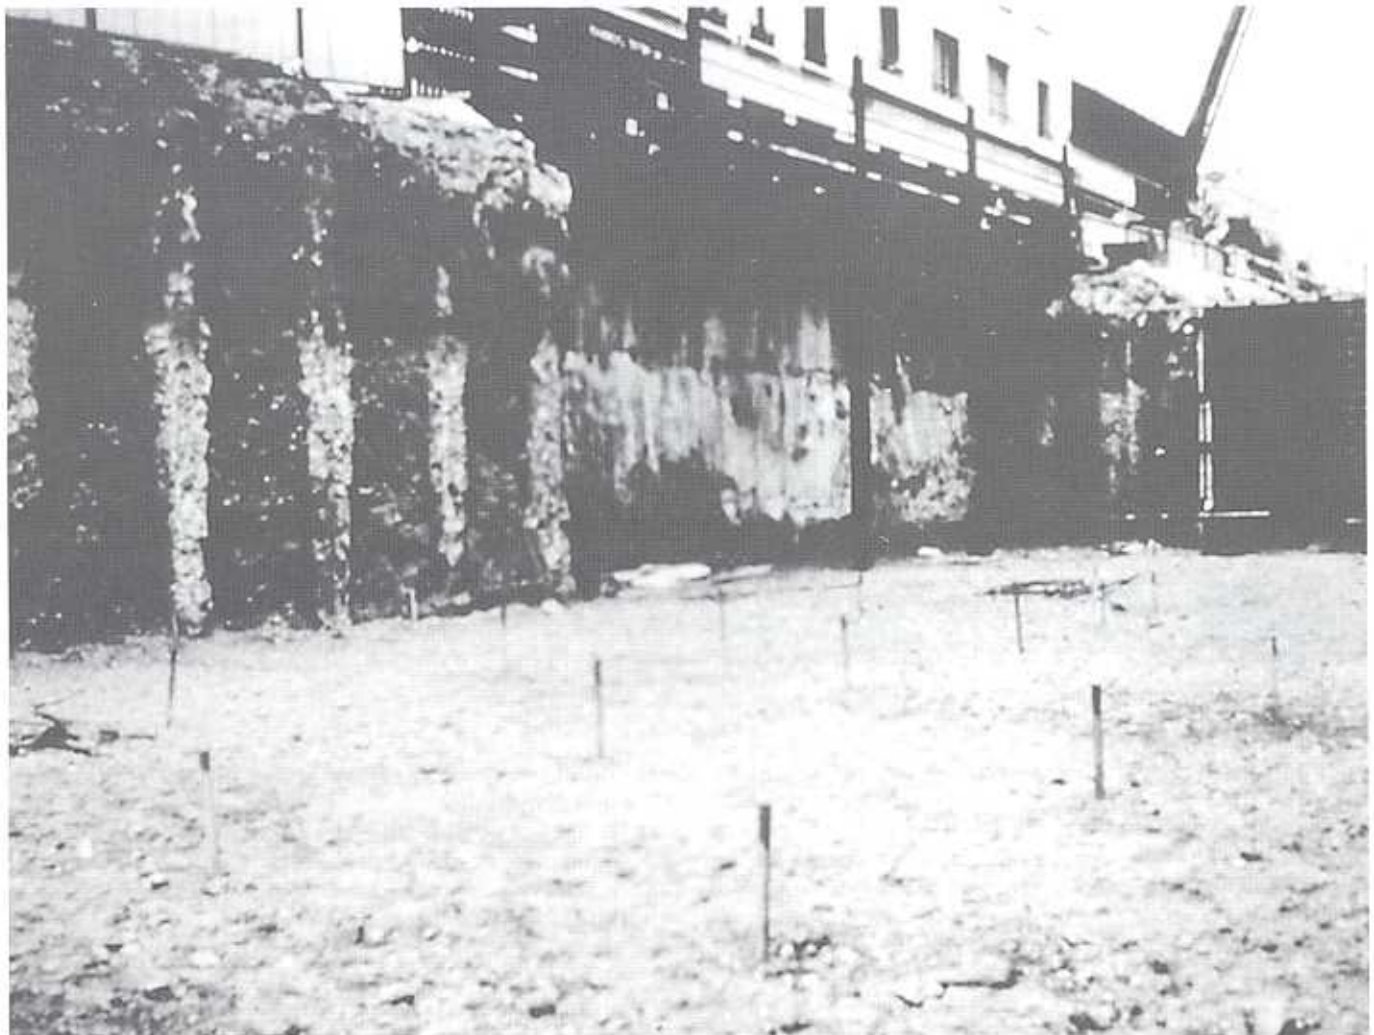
Improved ground by jet-grouting for cut and cover excavations of the 'Sans Souci' station on line D of the metropolitan railway in Lyons (France)
